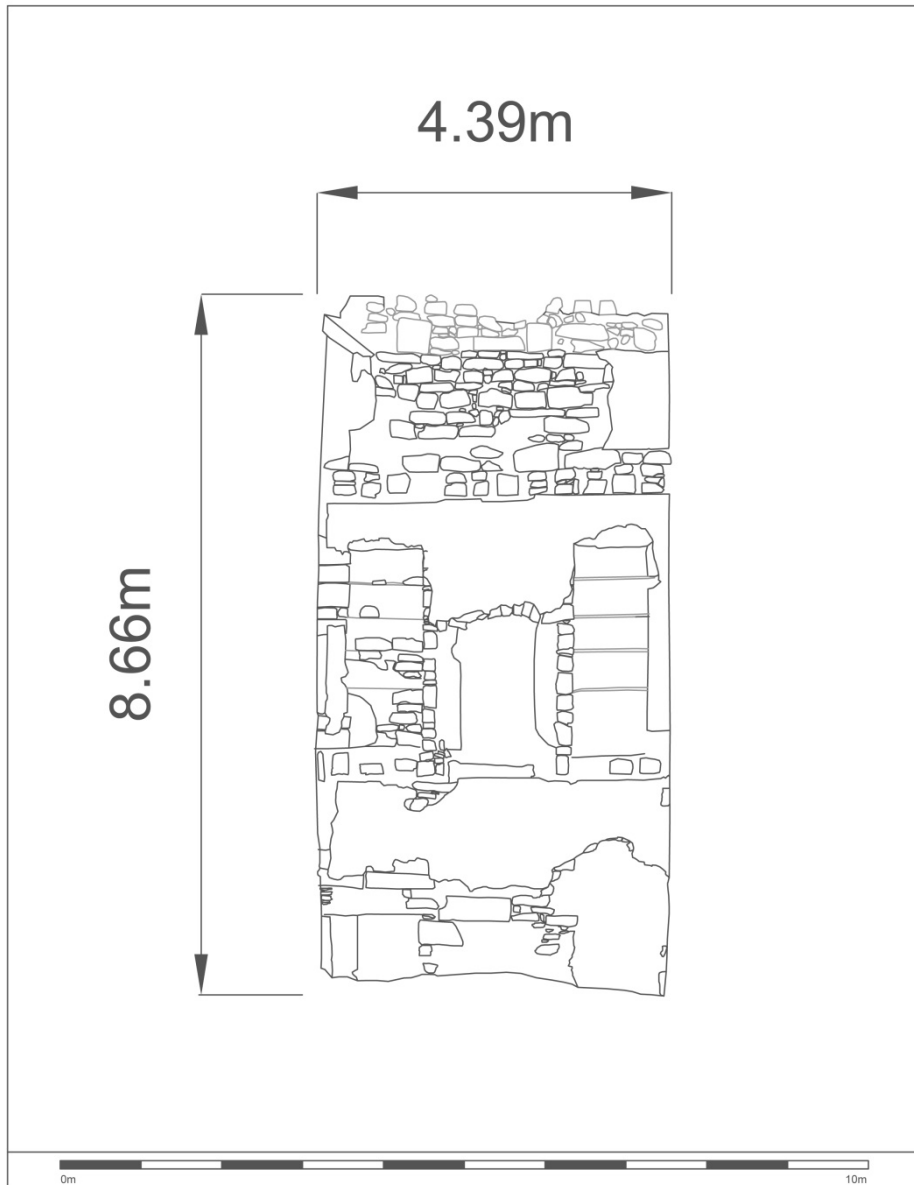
Internal elevation of the north-east wall of the signal tower at Inishmore Signal Station.
